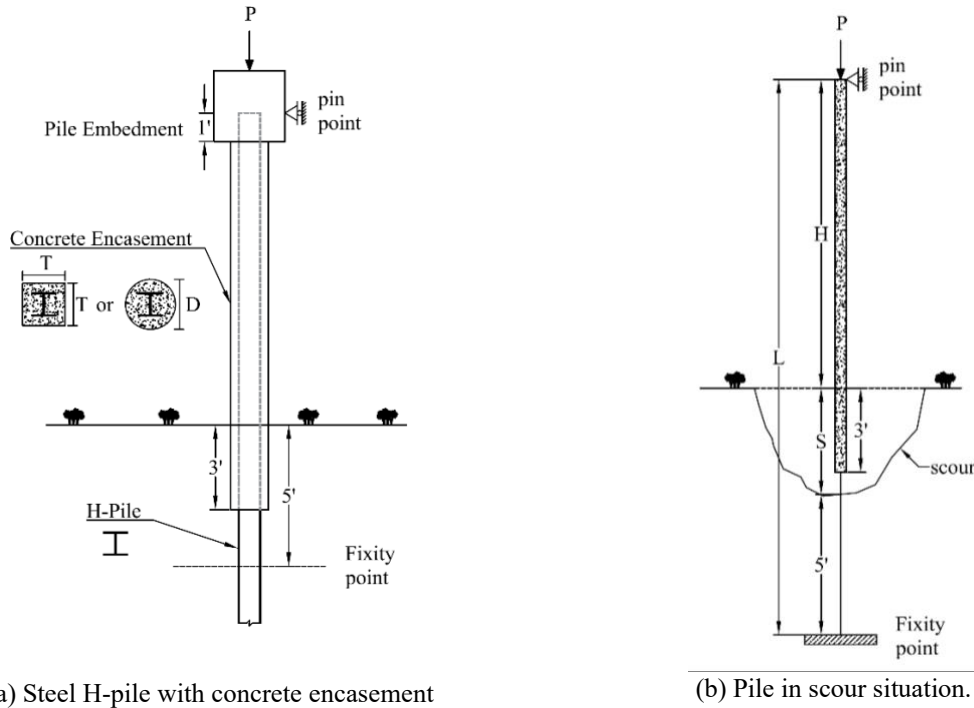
Schematic view of a pile foundation with concrete encasement and in a scour situation
